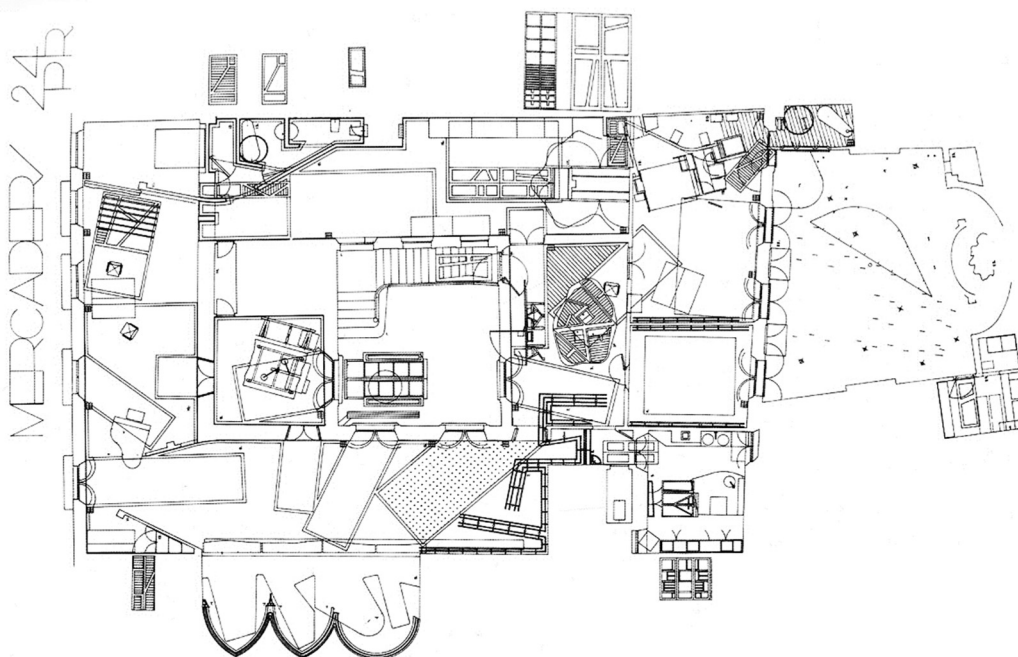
Renovations of an apartment on Calle Mercaders, Plan (image source: EMBT).
